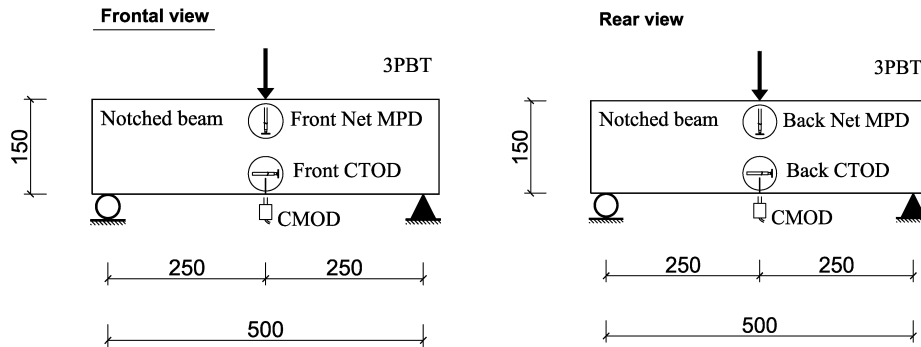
Three-point bending test set-up: a) front view; b) back view.
